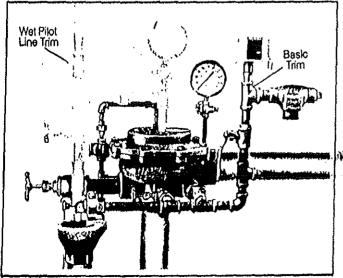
Model A Deluge Valve with Basic Trim and Wet Pilot Line Trim
